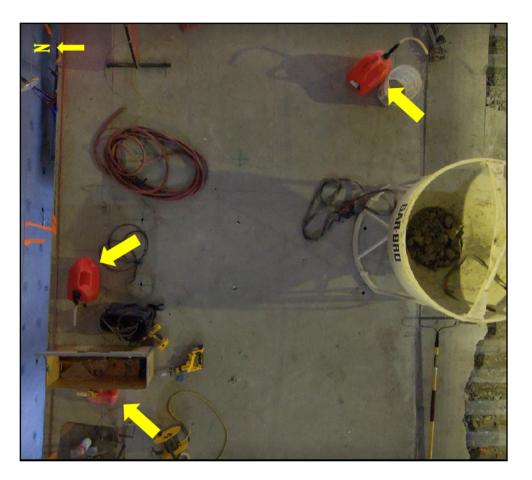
Images showing the condition of the surrounding floor after the incident – multiple flammable liquid containers are stored on the floor (yellow arrows).
